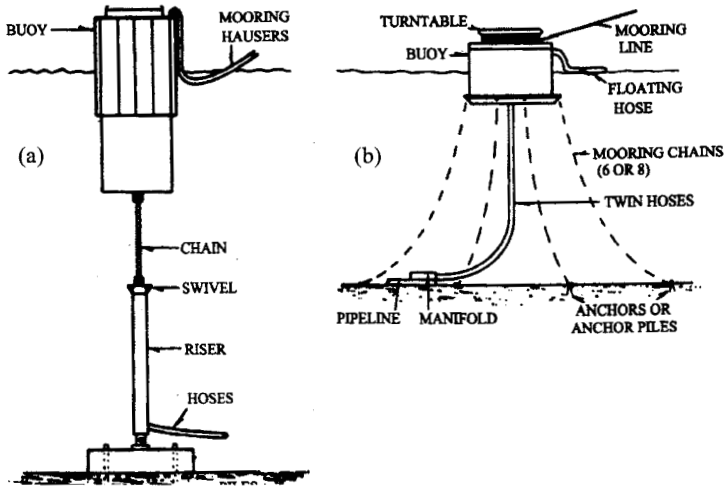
Two single-point mooring systems: (a) a single anchor leg mooring (SALM); (b) a catenary anchor leg mooring (CALM).
